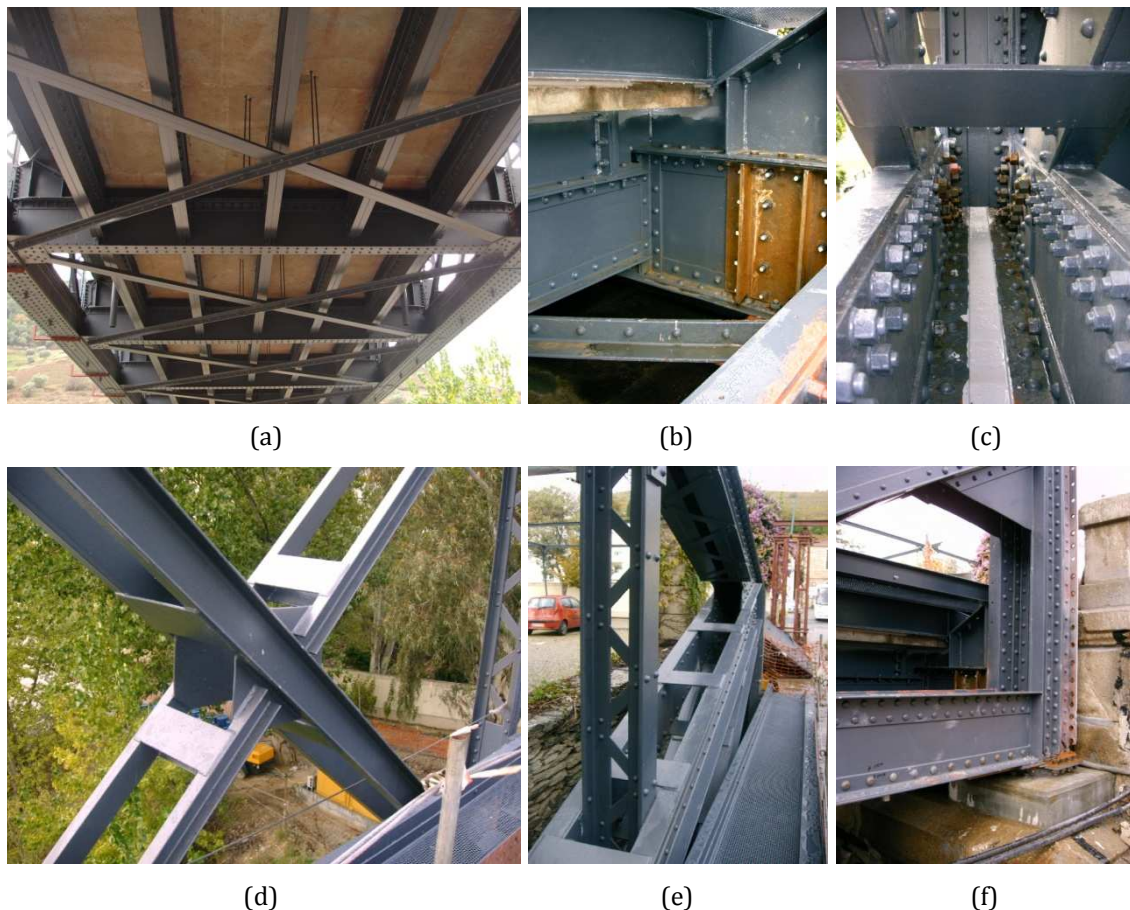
Pinhão Bridge after the construction works: (a) strengthened floor system with the new concrete slab; (b) detail of the strengthening applied to a crossbeam at its end; (c) strengthened lower chord (new-added angles at the webs tops); (d) new diagonals; (e) strengthening of a vertical; (f) new disk bearing at the north abutment.
